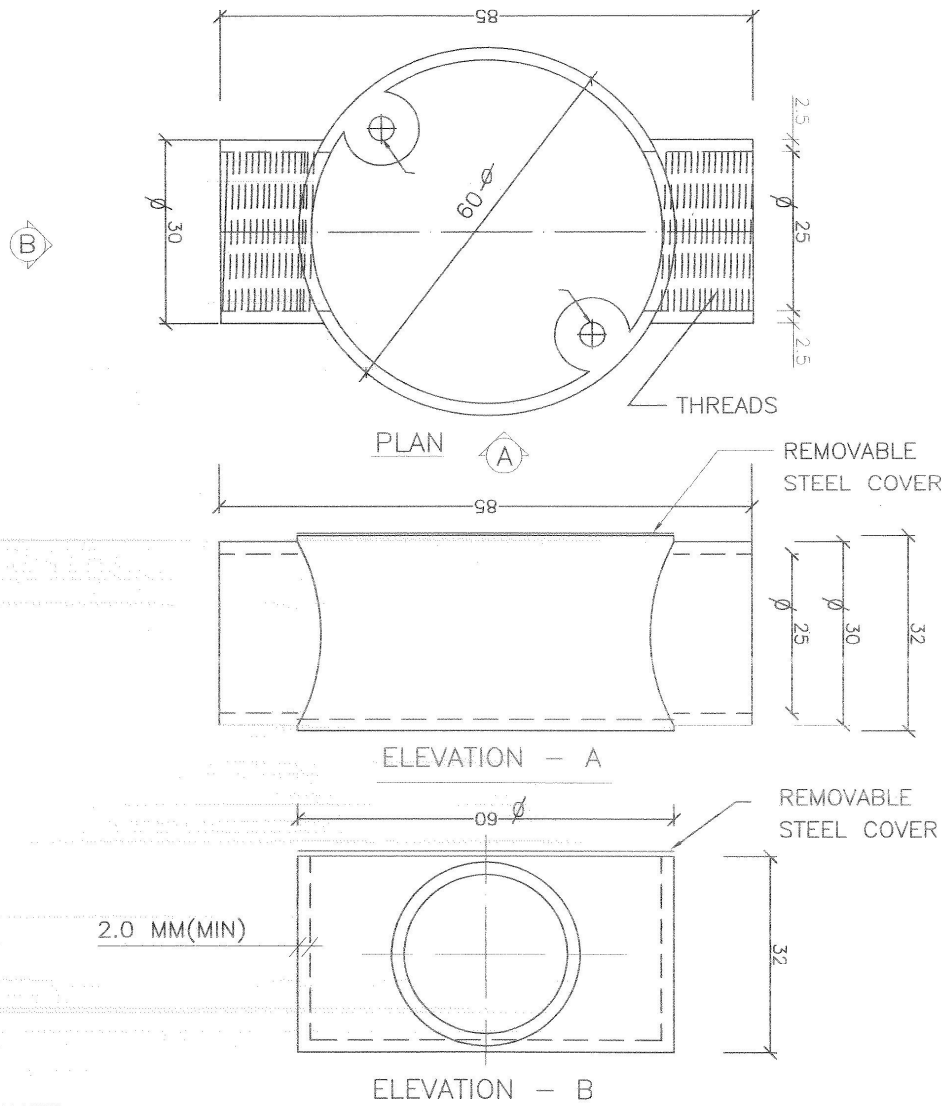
A, Details of outlet box for installation of light fitting on Slab.
